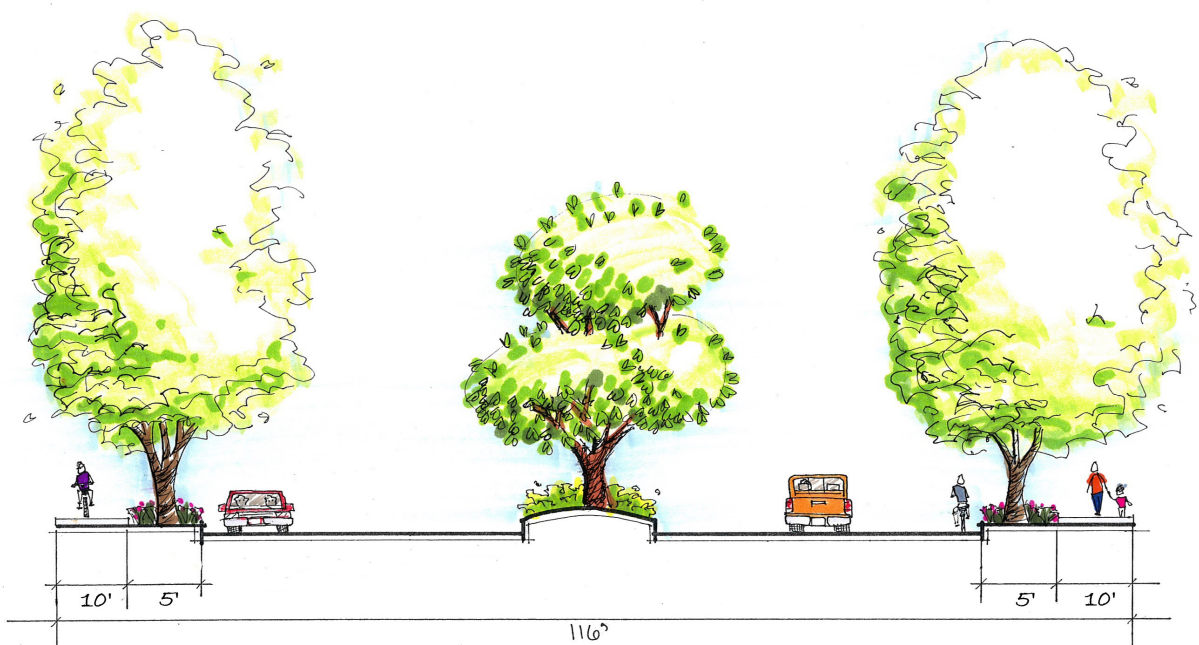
EXHIBIT E: SOLEDAD CANYON ROAD ROADWAY CROSS SECTION
